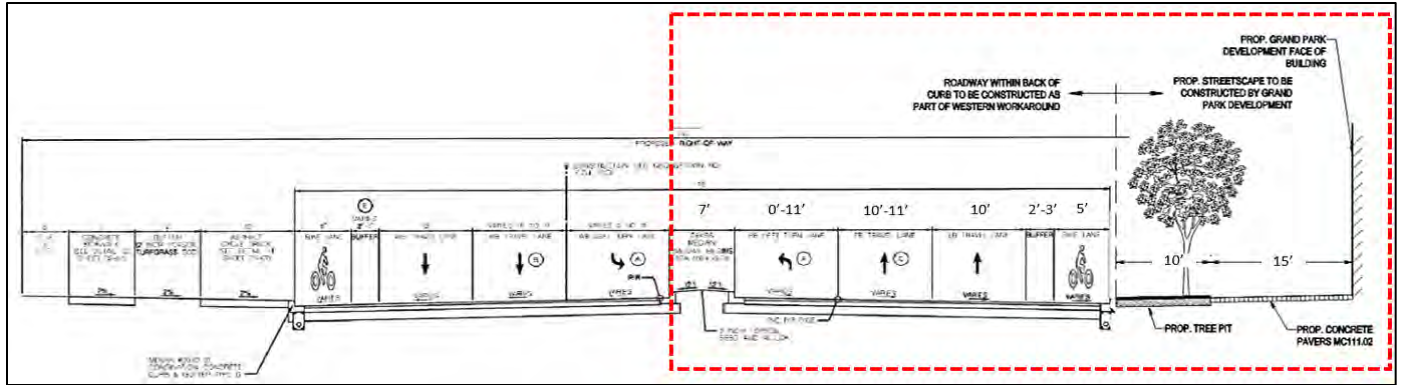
Proposed Old Georgetown Road East-West Section (Subject Property Frontage Identified within Red Dashed Outline)
